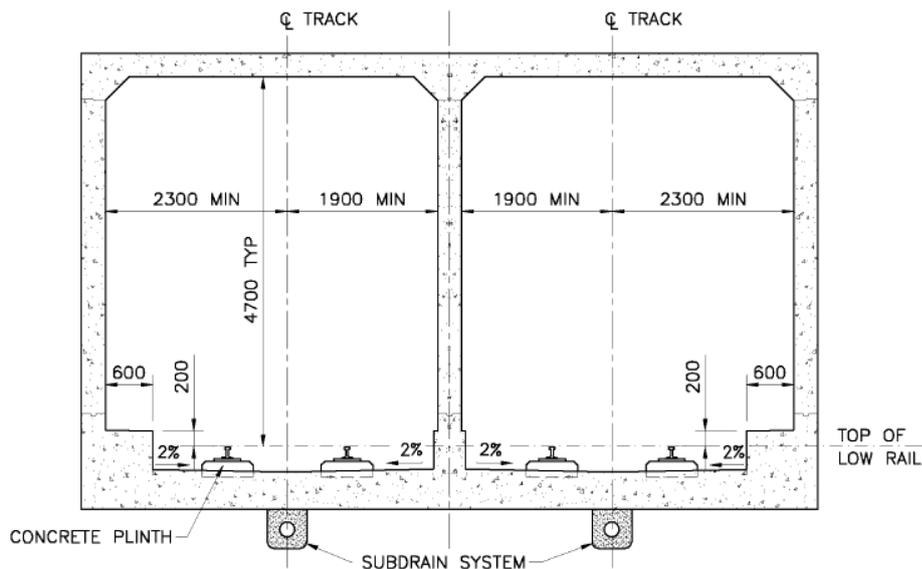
Cross-section of direct fixation trackway on tunnel
